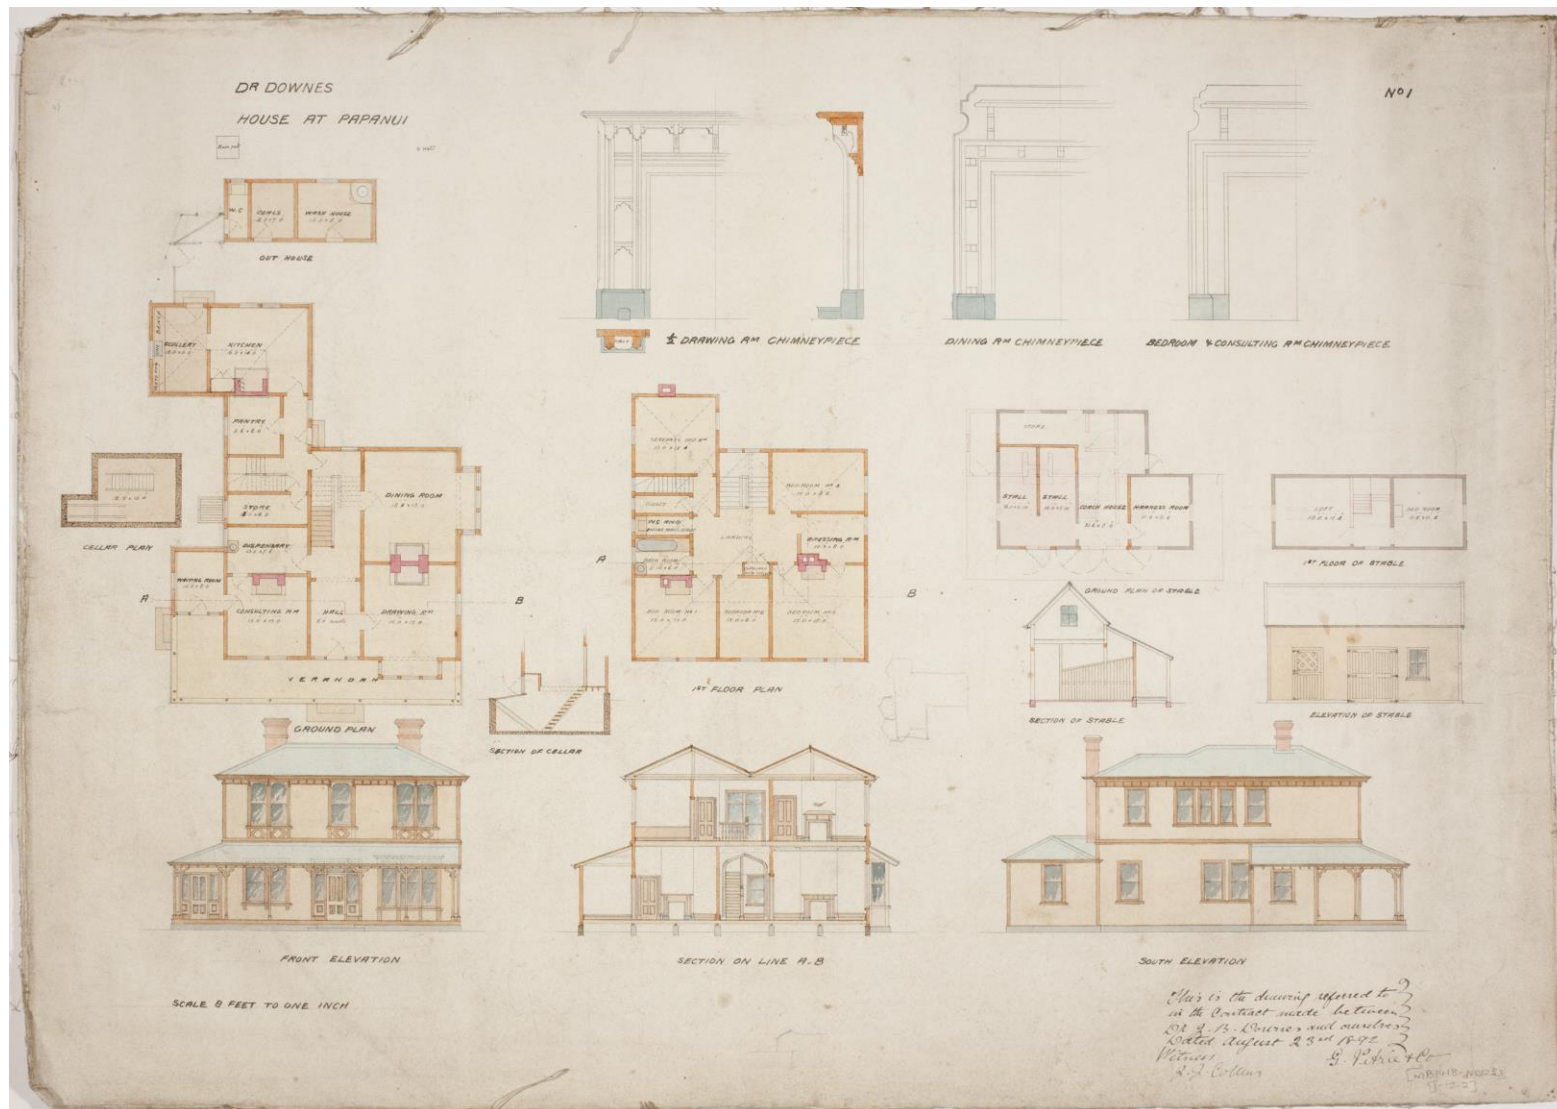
Collins and Harman, Dr Downes, House at Papanui, plans, elevations, sections and details (1892).
